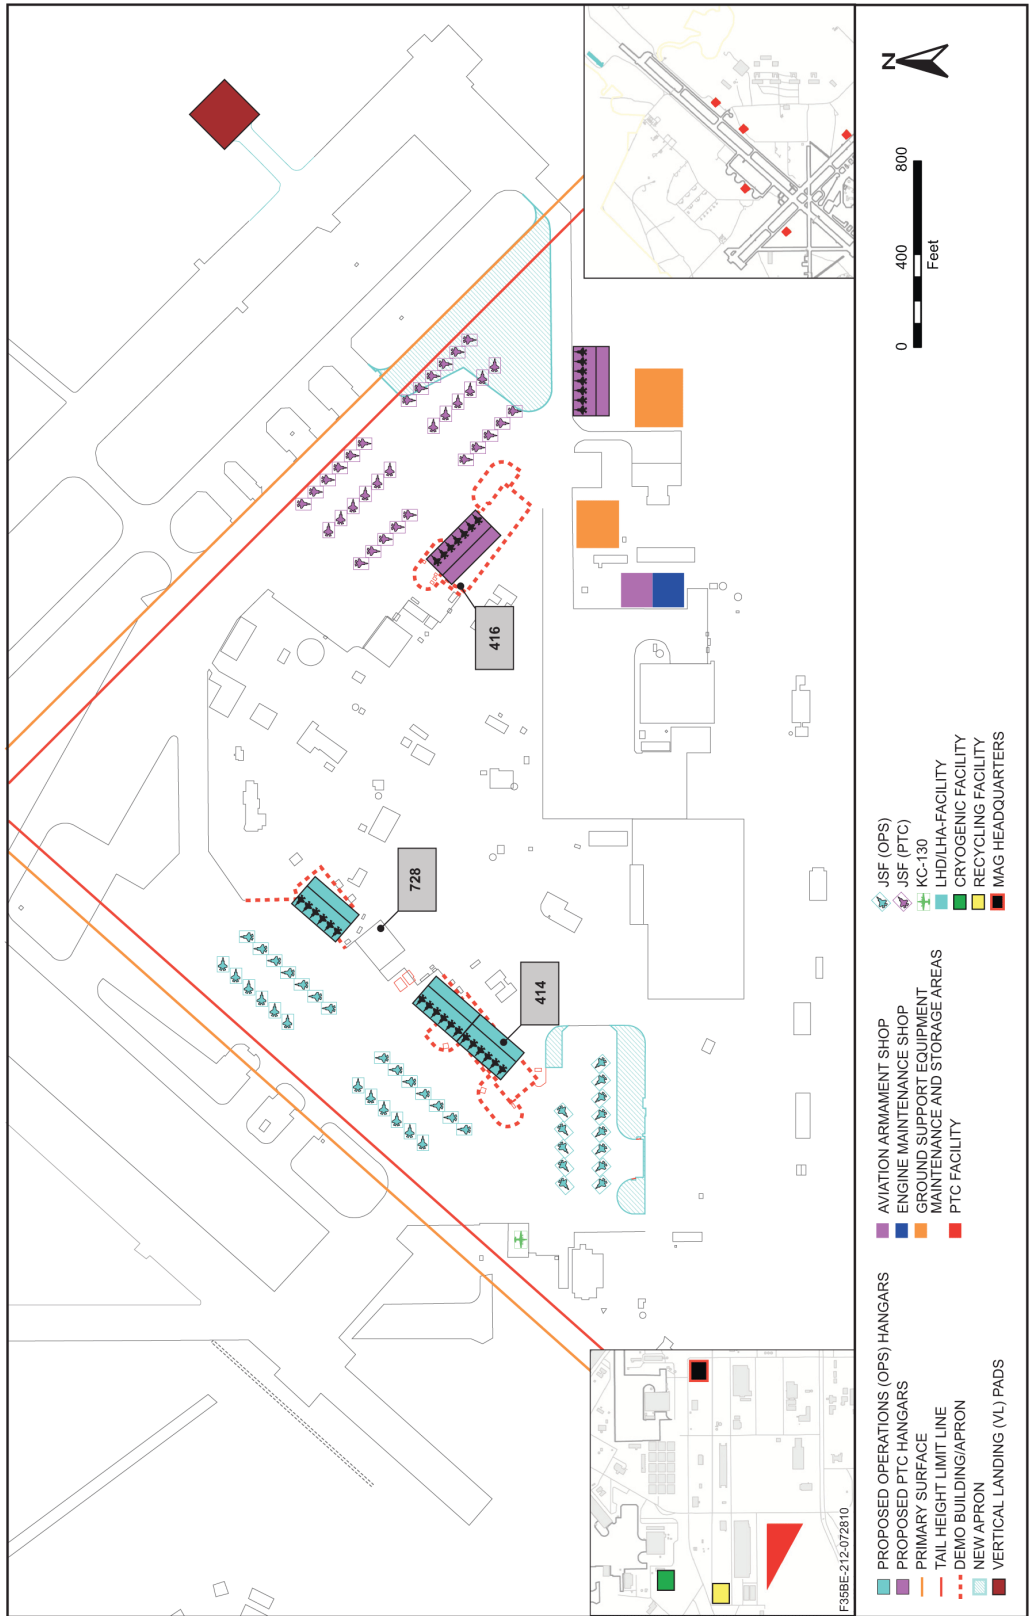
MCAS Beaufort Proposed Flightline Construction and Support Facilities under Alternative 1
